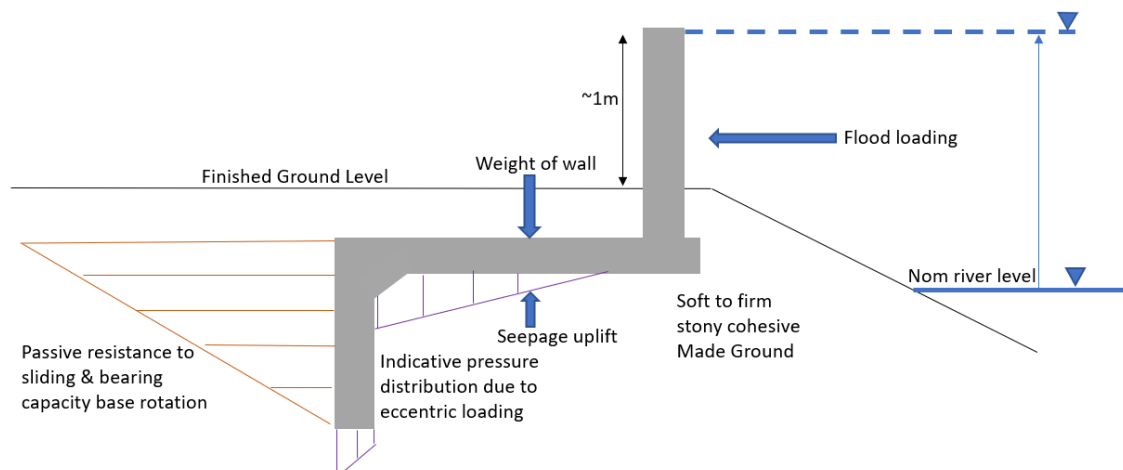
Indicative section of flood wall subject to seepage uplift and lateral flood pressure.
